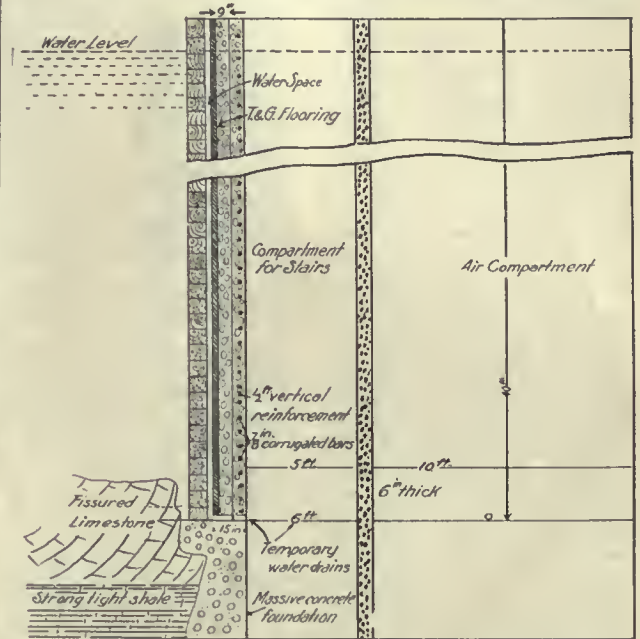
SKETCH OF RECTANGULAR REINFORCED-CONCRETE SHAFT-DAM TO WITHSTAND WATER AND GROUND-PRESSURE.
